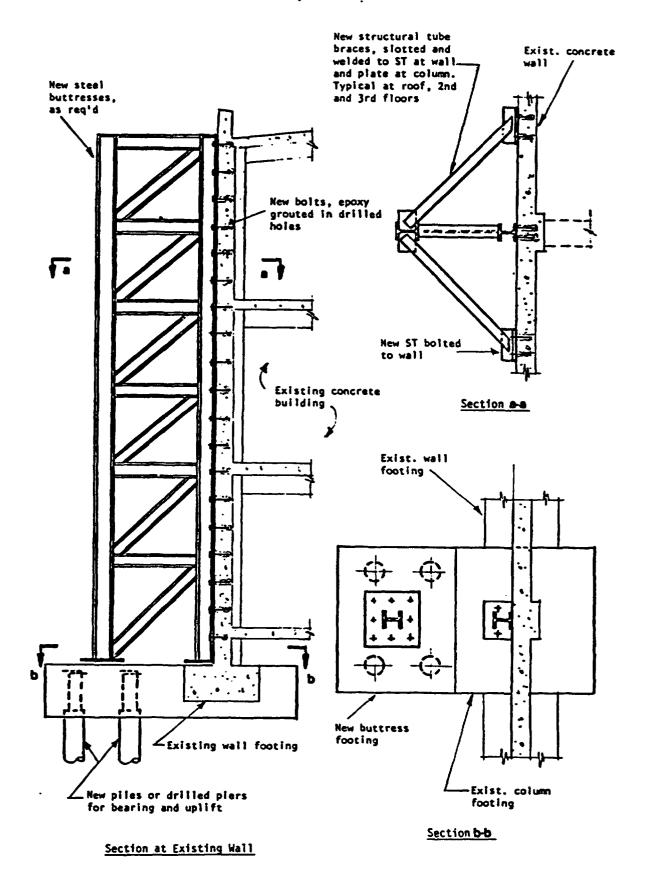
Braced structural steel buttresses to strengthen an existing reinforced concrete building
